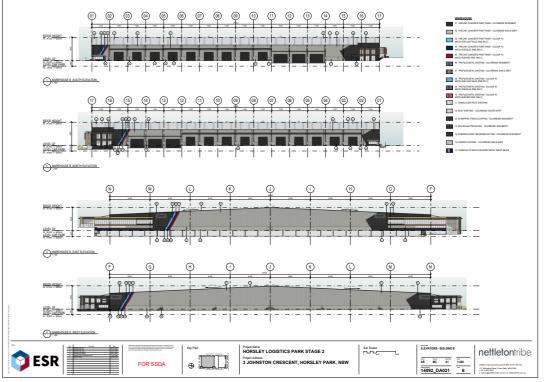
Warehouse Elevations - Building B (Source: Nettletontribe)
